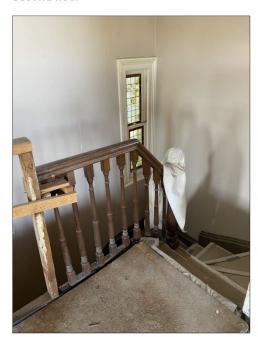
The top of the stair and leaded stair window remain. The early walls between the two front bedrooms and later ceilings, existing skylights and bathroom added as part of the 1990s works have been removed.
